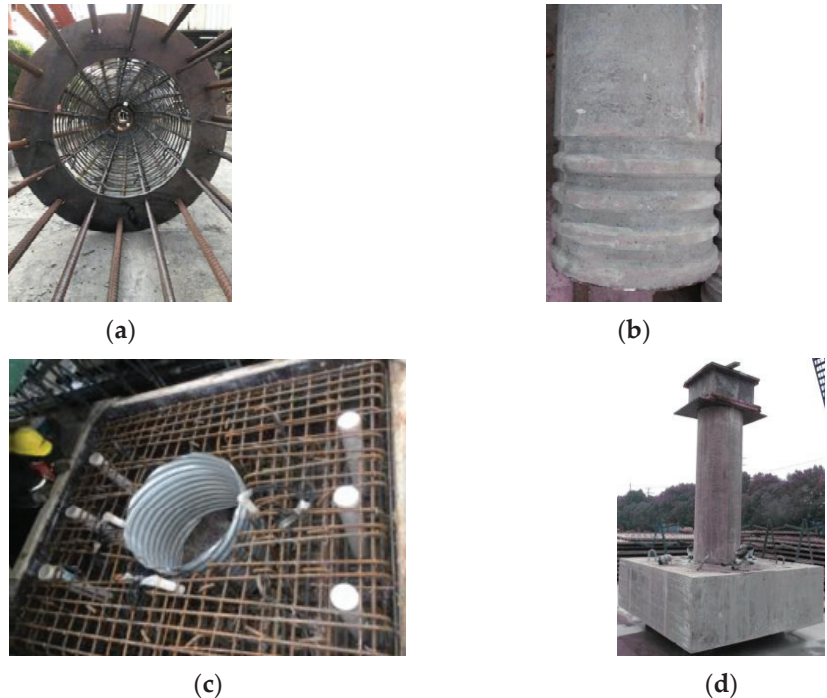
The model construction process. (a) Bridge pier reinforcement cage; (b) pier shear key; (c) cap steel cage; (d) model test piece.
